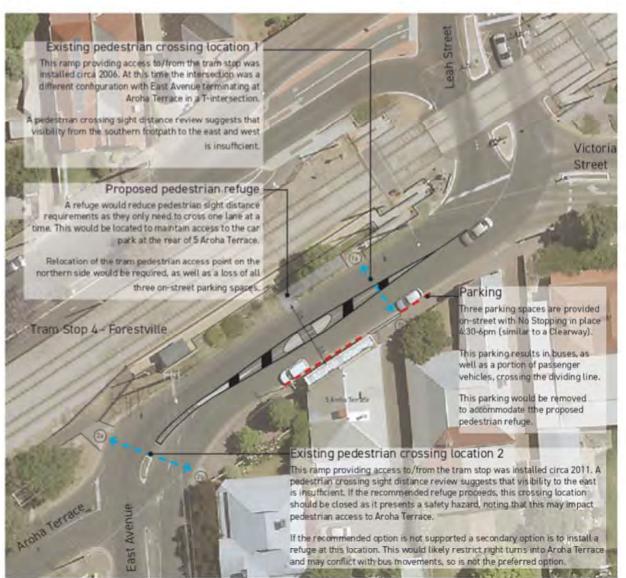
Existing crossing locations and pedestrian refuge concept
